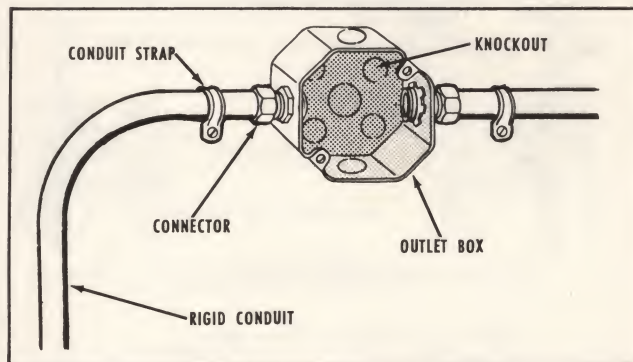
RIGID CONDUIT WIRING SYSTEM
